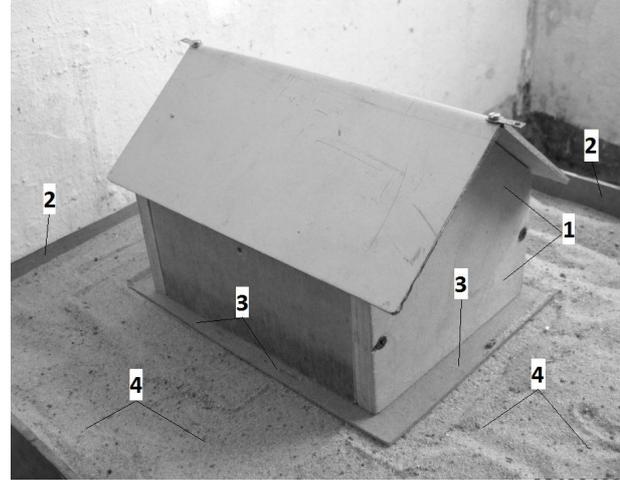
Scheme of the test: 1 – building model; 2 – subsoil tray; 3 – slab foundation; 4 – ground foundation
